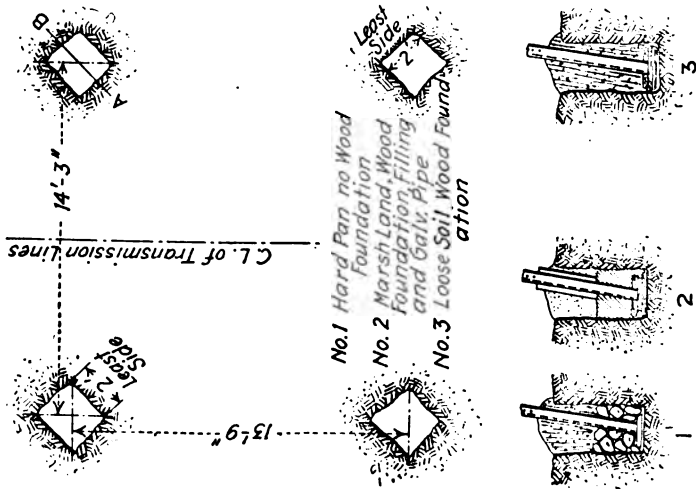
MEXICAN LIGHT AND POWER CO., LTD. PLAN AND SECTIONS OF TOWER FOUNDATIONS
